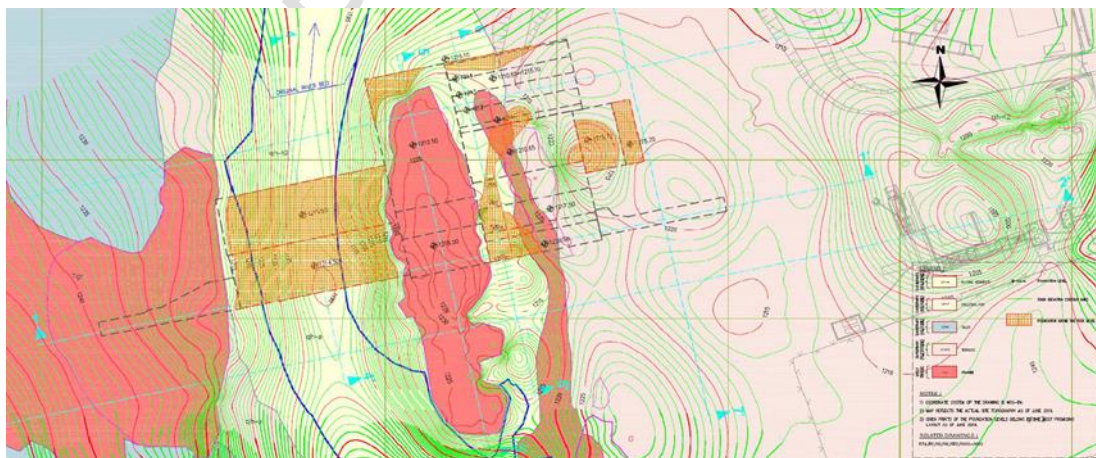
Detailed geological engineering map indicating plant foundation area [11]
